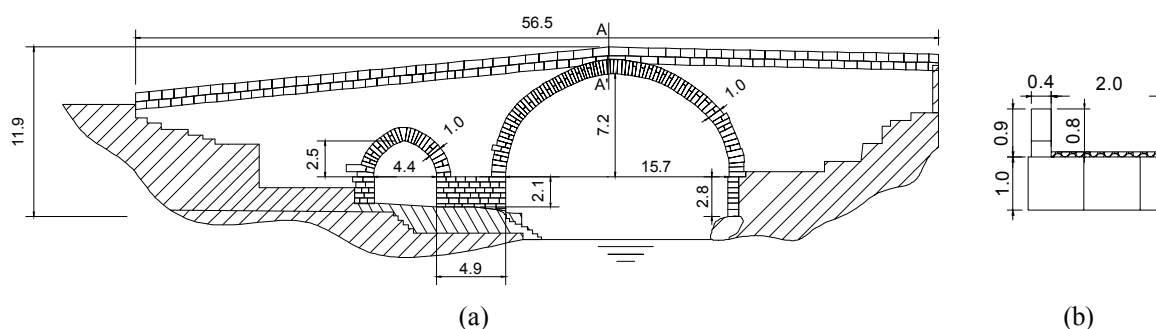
Romanic bridge of Mondim da Beira: (a) downstream elevation; (b) section AA' (drawings are not to scale)
